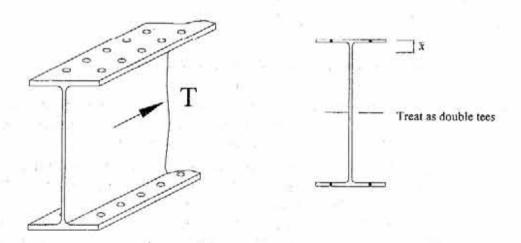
Determination of \overline{X} for I-Sections Connected at Flanges
